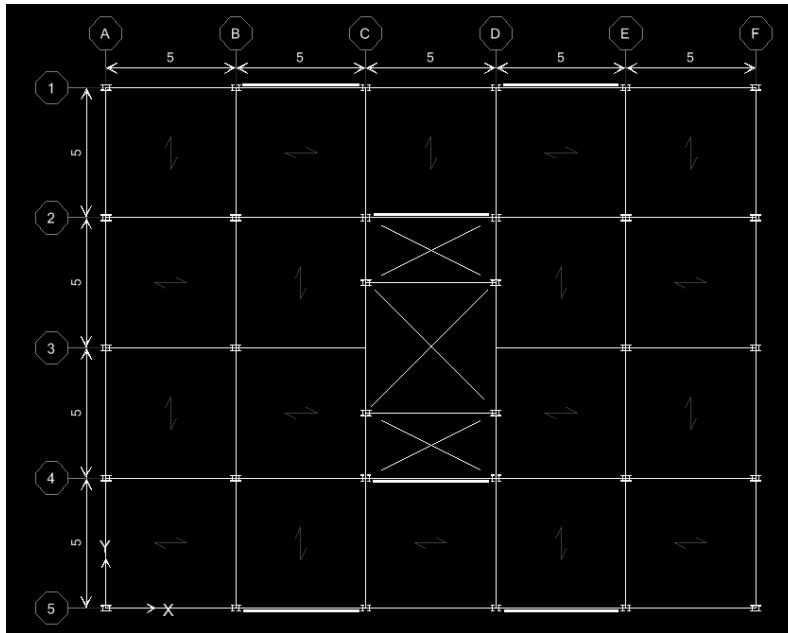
Medium plan (25m x 20m) for 3, 6 and 10 story buildings and locating of braces.
